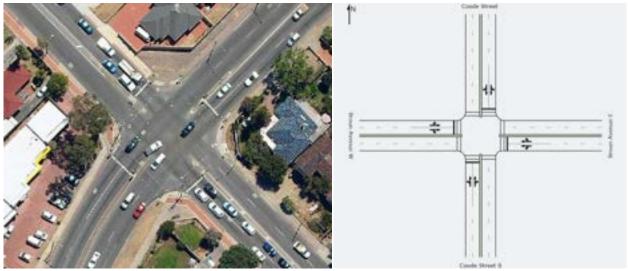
Broun Avenue/Coode Street – Existing Geometry
